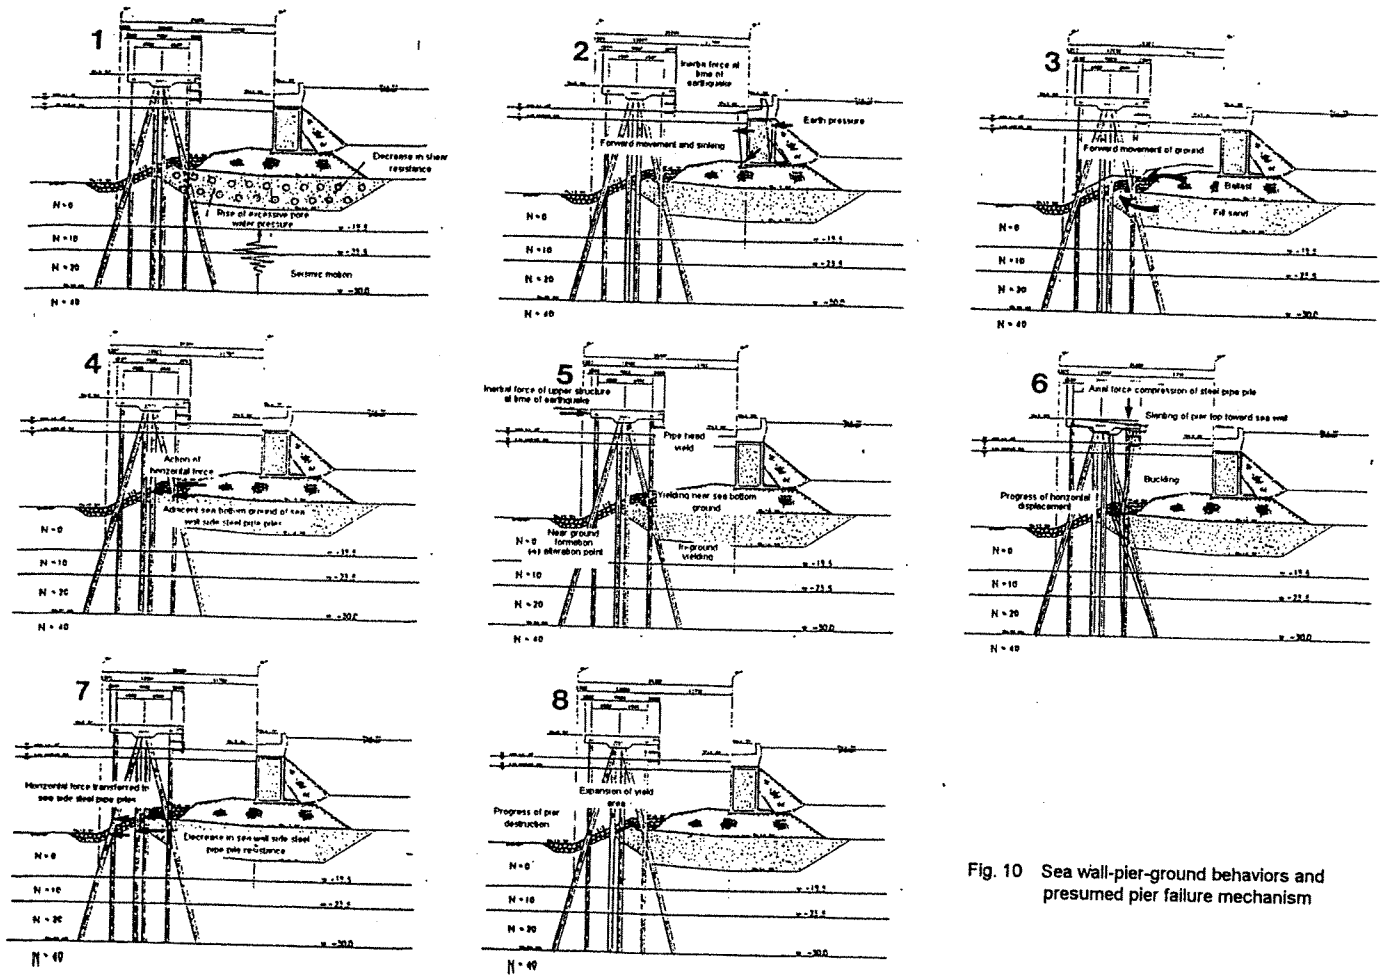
Sea wall-pier-ground behaviors and presumed pier failure mechanism
